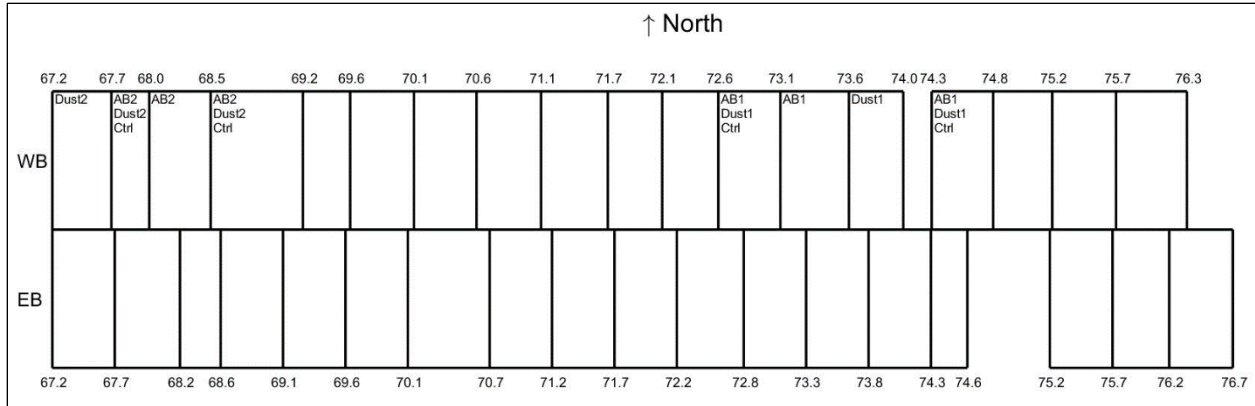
GLE-162: As-built lot layout showing experimental sections.
